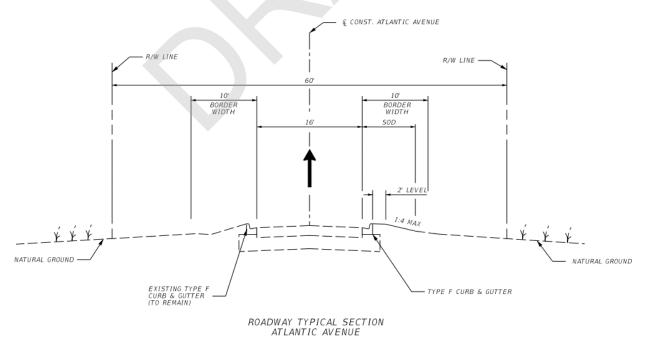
Existing Atlantic Avenue Roadway Typical Section
